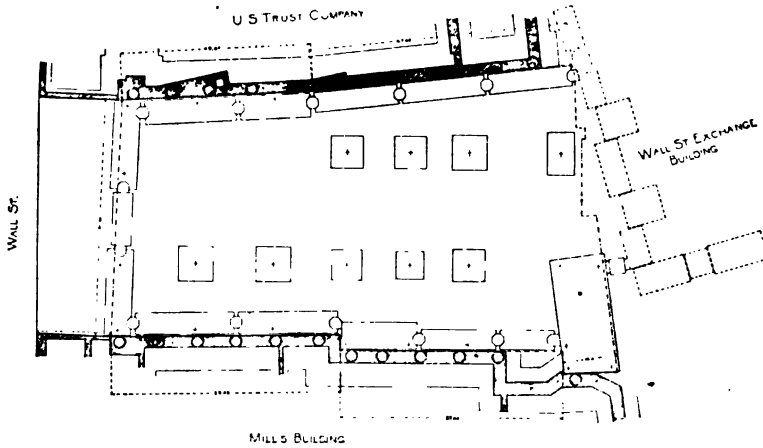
SHOWING EXTENT OF PROPERTY AND WALL FOOTINGS OF ADJACENT BUILDINGS.
